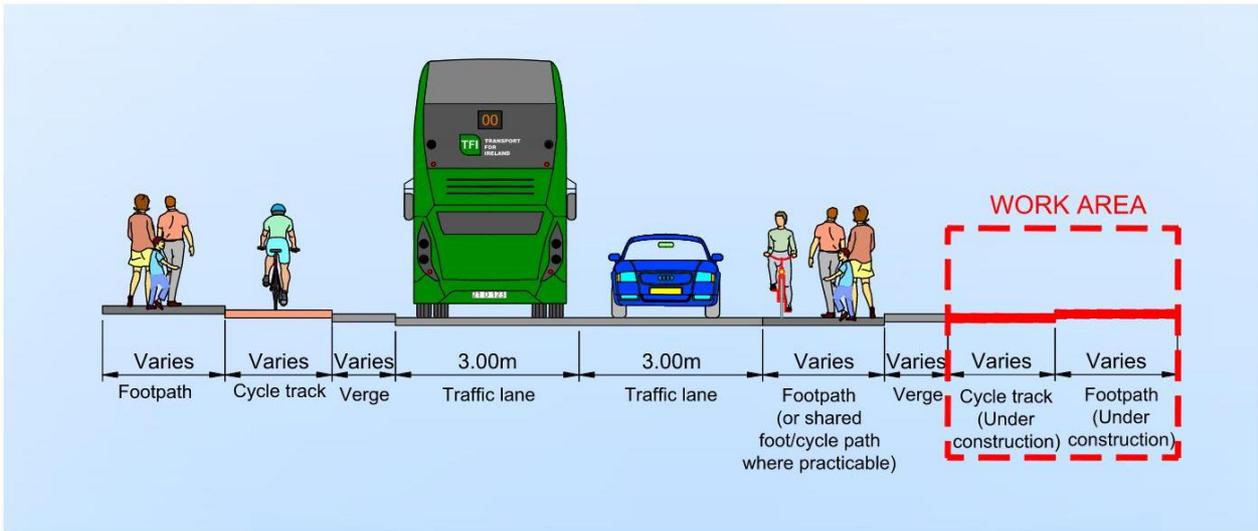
Traffic Management Cross Section, Section 2a – Stage 1
